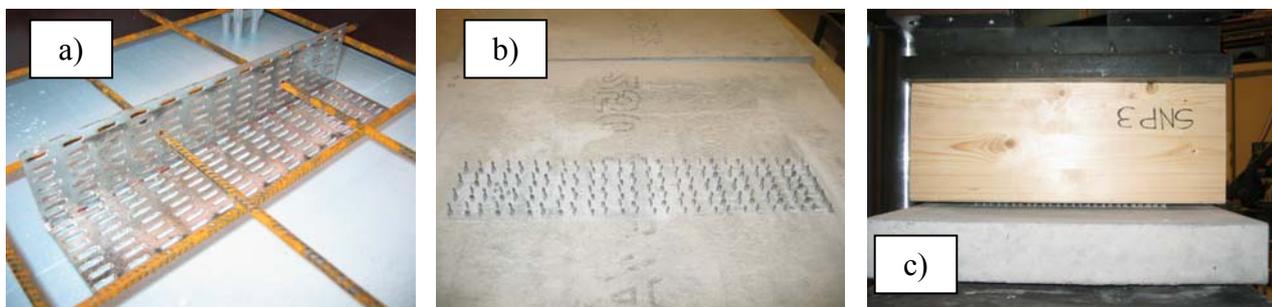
Nailplate connector type a) in moulding form, b) prefabricated slab, c) pressing glulam member into concrete slab
